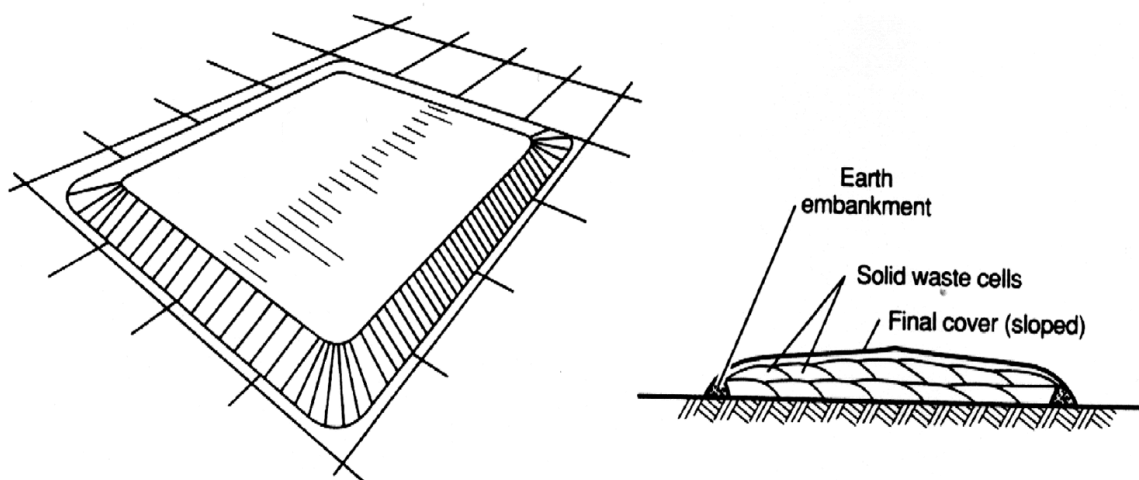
Plan and cross-section of Area method, Tchobanaglou et al., (1993)
